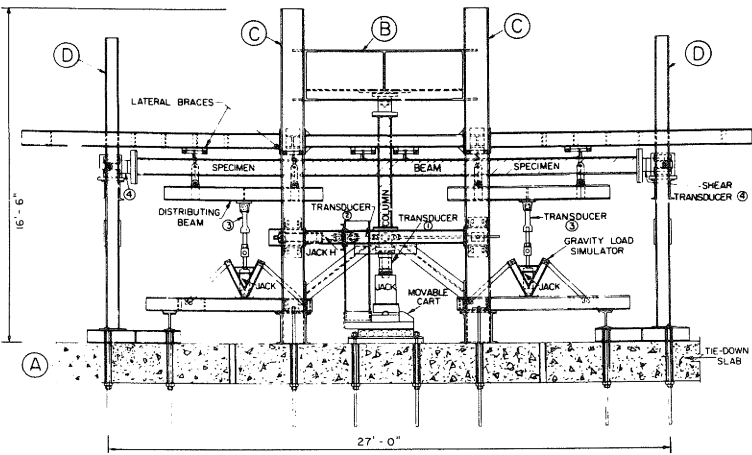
TEST SETUP USED FOR TESTING BEAM-COLUMN SUBASSEMBLAGES (51)
